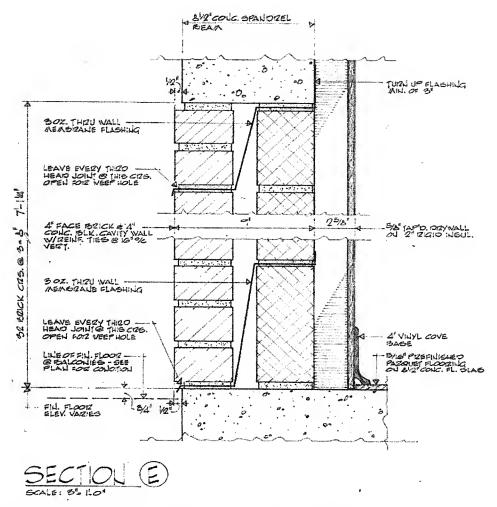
Typical wall section from original construction documents, prepared by Robert Charles Associates, Inc., dated December 11, 1967. Note locations of through wall flashings.
